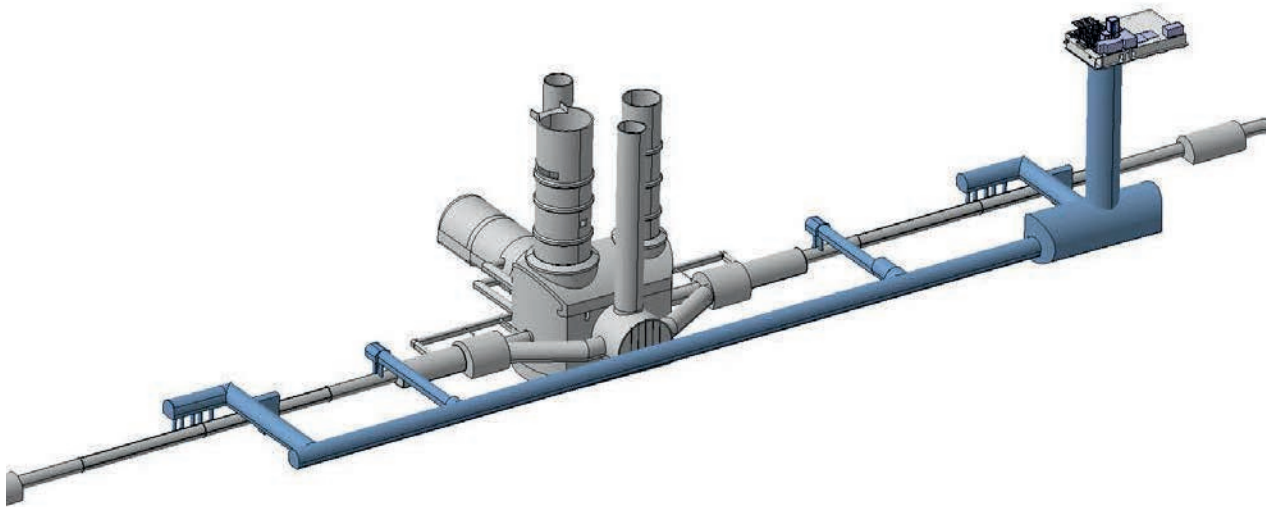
Assonometric view of the HL-LHC underground civil engineering infrastructures as it would appear in IP1.
